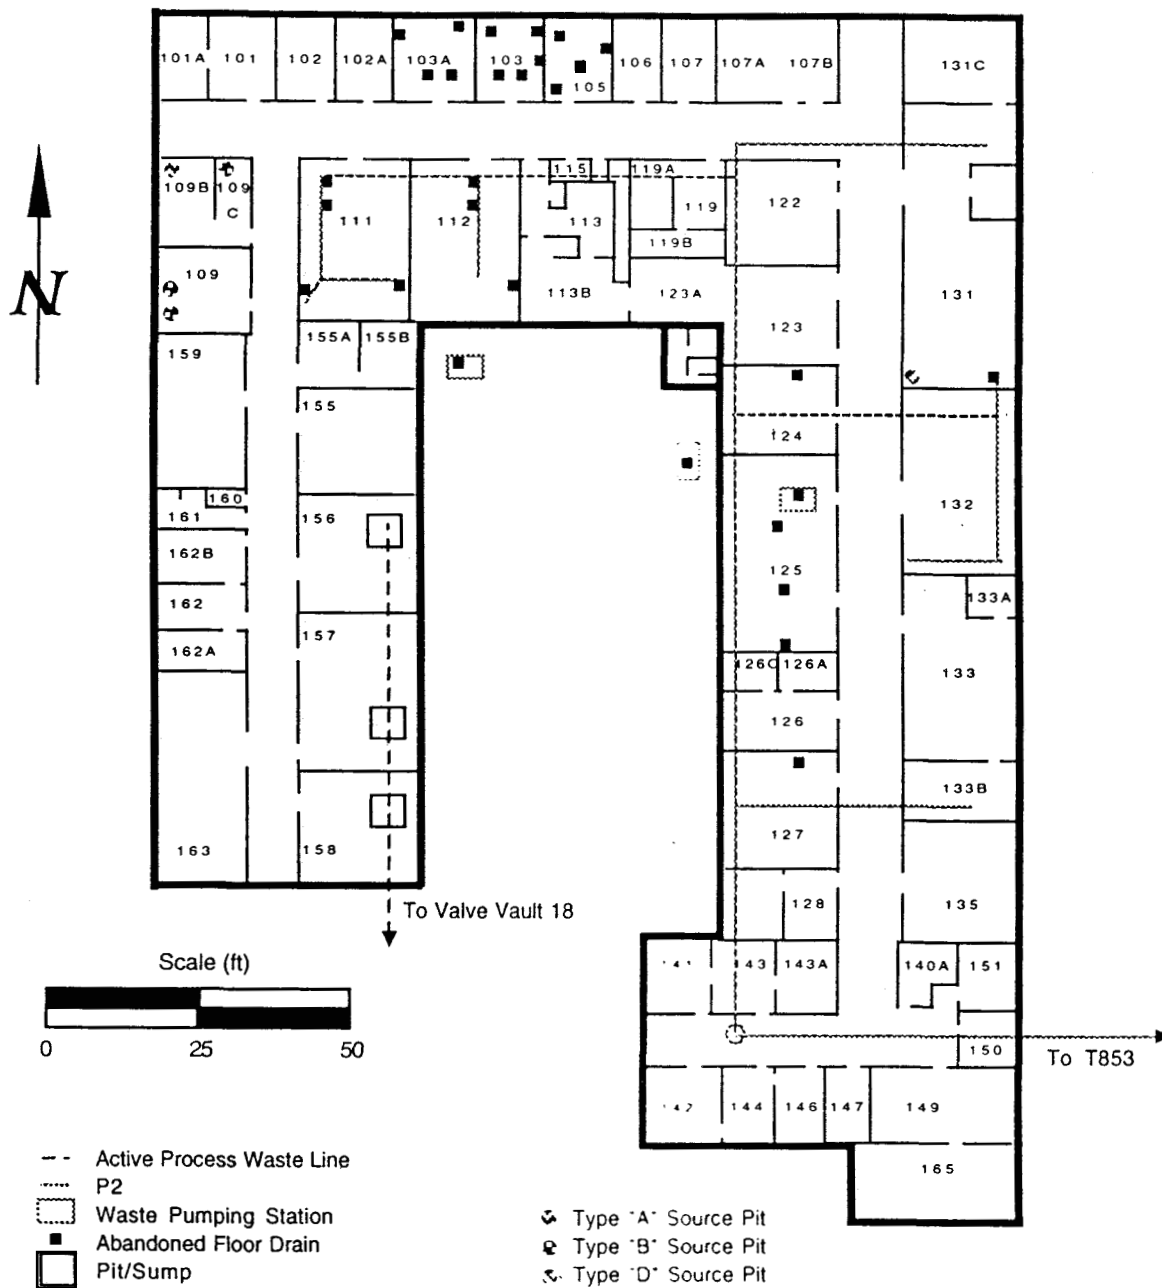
Locations of Abandoned Floor Drains and Pits in Building 123
